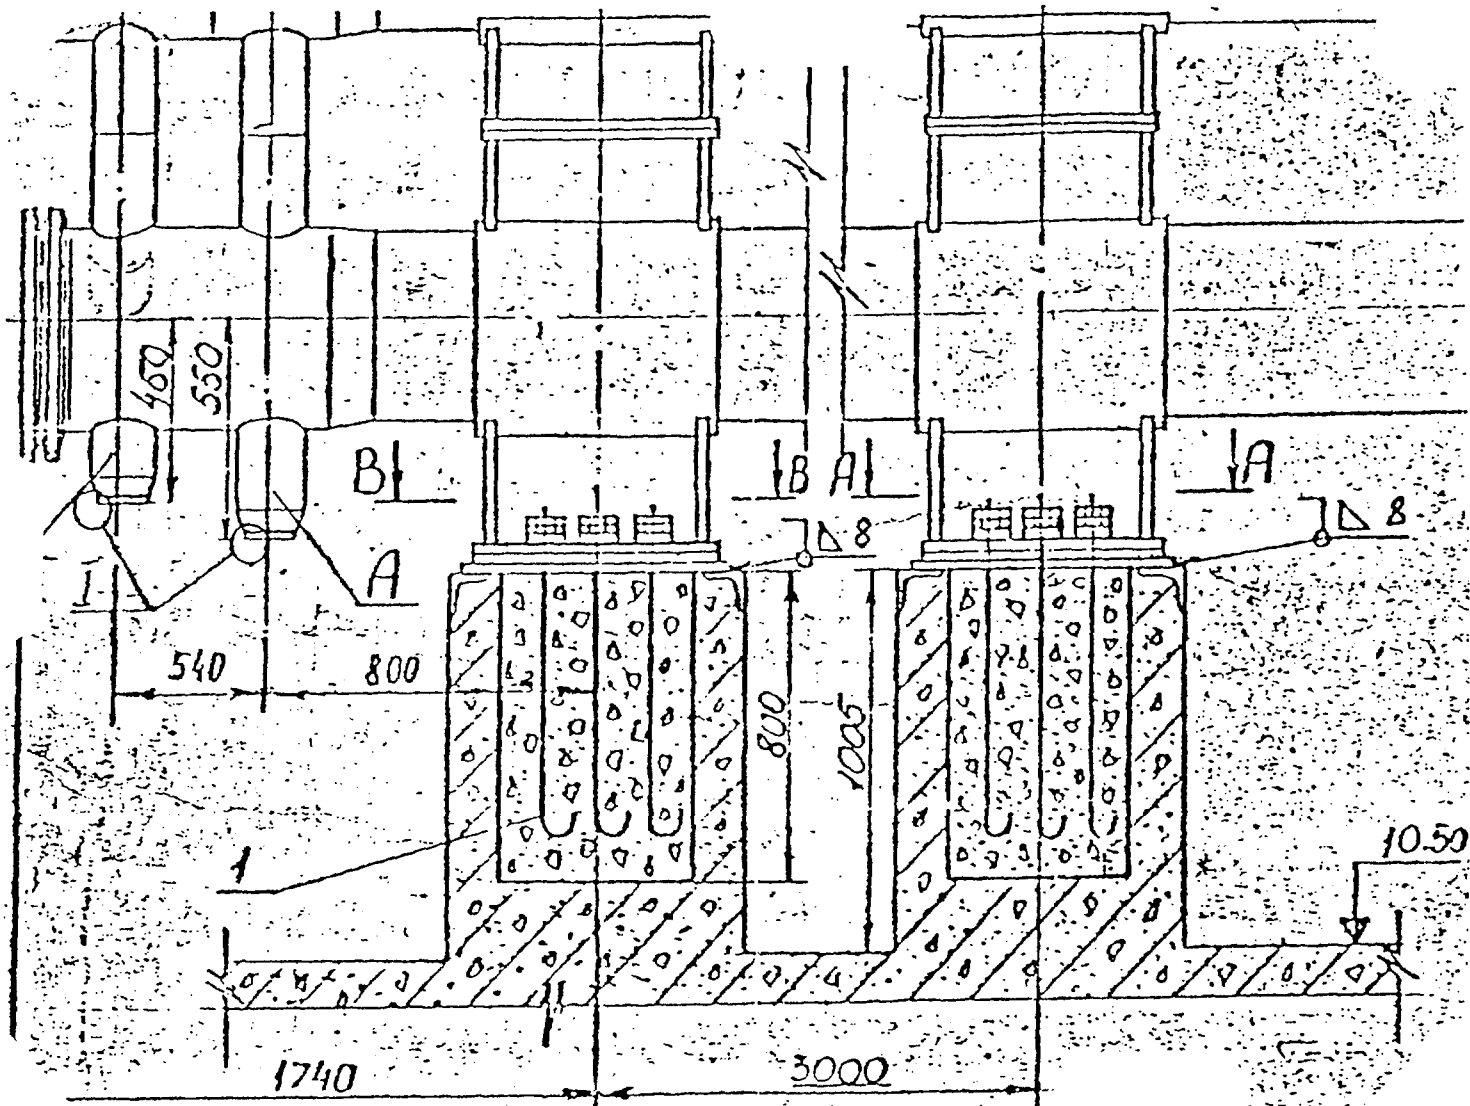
Anchorage of a Typical Heat Exchanger by Means of the Grouted-in-Place J Bolts into the Concrete Pedestal with Problematic Reinforcement
